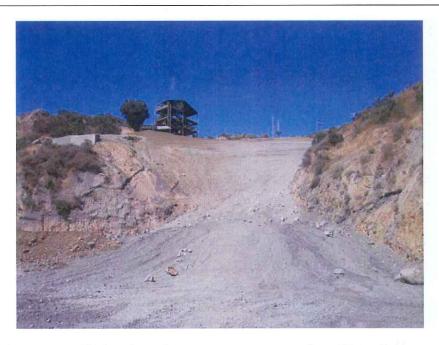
Looking west at fill placed in a drainage to mitigate past slope failures below conveyor that deposited limestone waste rock into EMSA drainage. Slopes will be hydroseeded before this winter. Compare with Photo 14 in 2013 Annual Inspection report. Dated September 3, 2015.
